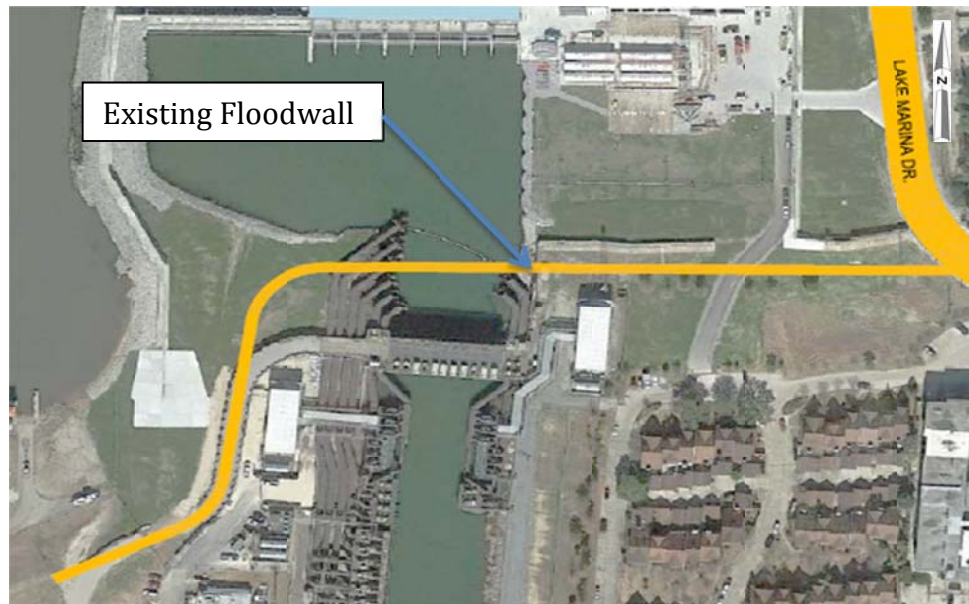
Alignment 2 Multi-Use Path and Bridge
